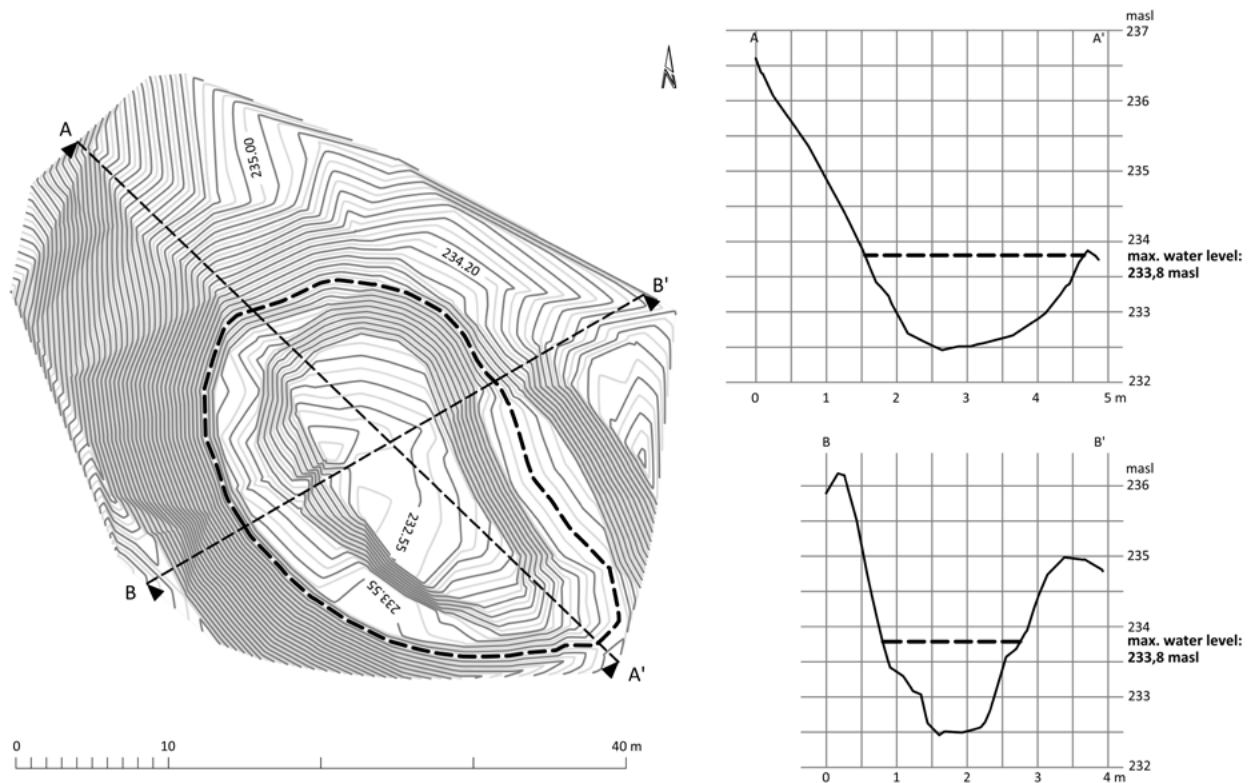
Presumed water reservoir inside line IV. Plan and profiles.
